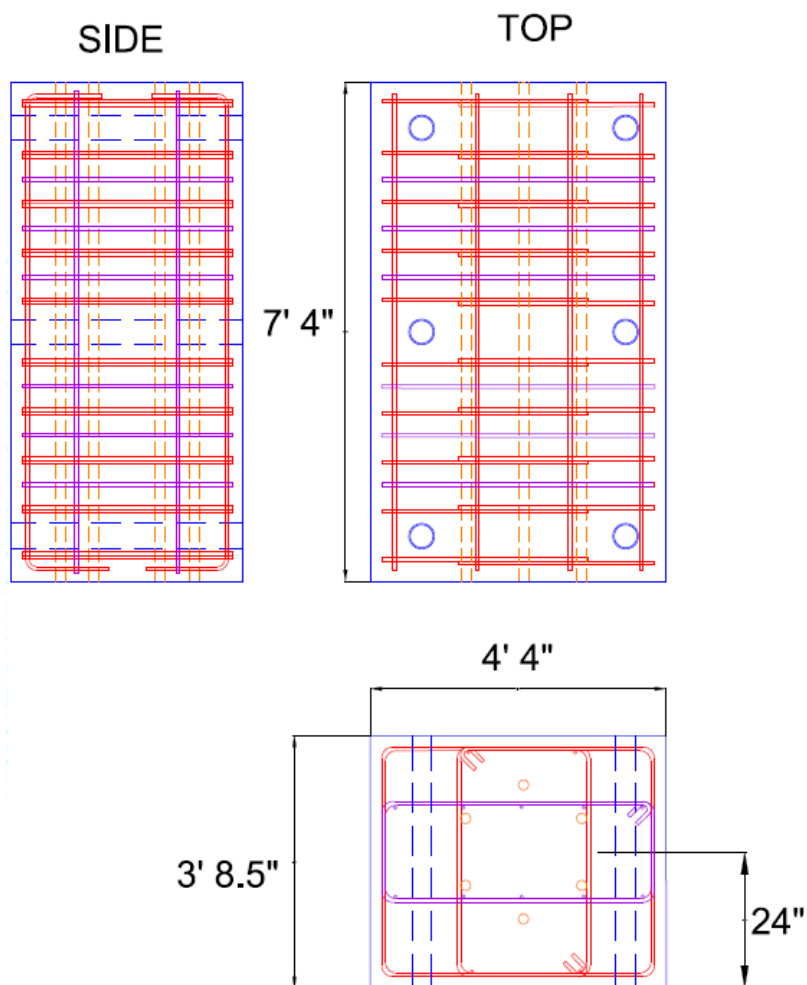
Dimensions and rebar layout for actuator anchorage block.
